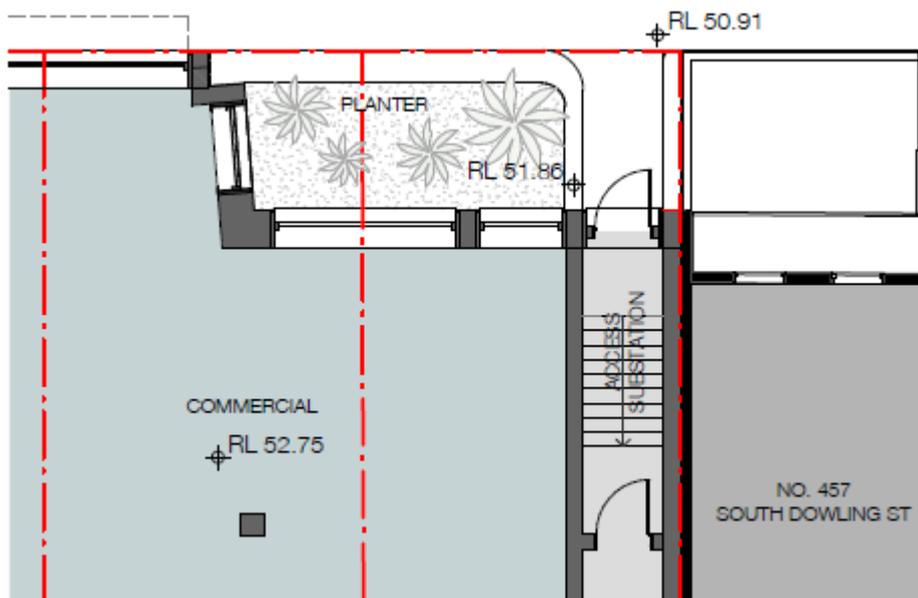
Building alignment (ground level), adjacent to 457 South Dowling Street
